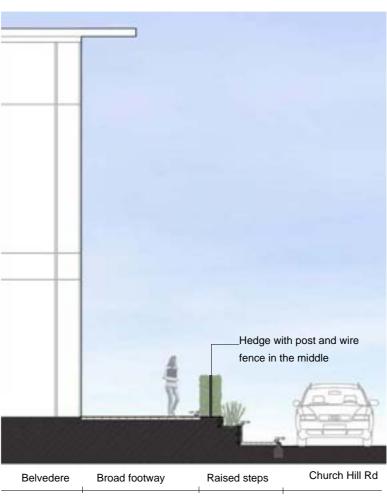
Section - Option 1 with raised planters or raised seating
